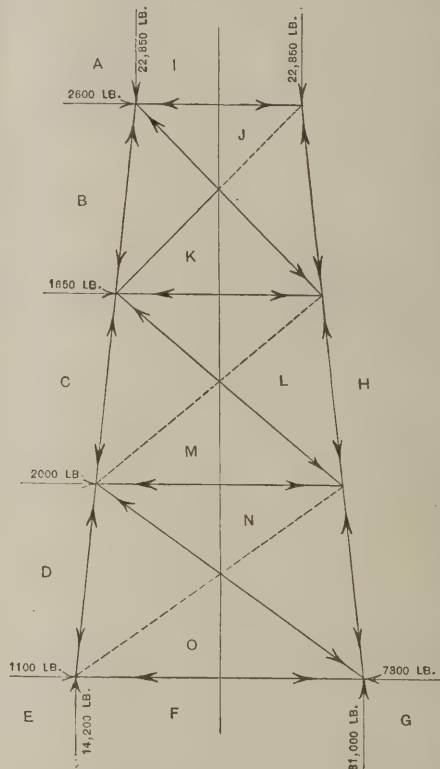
Frame Diagram.—Scale, 1/10 In. to the Foot.
